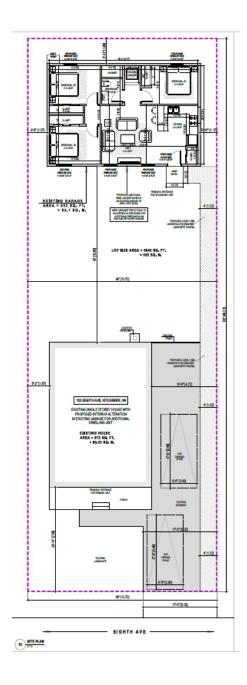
Proposed zoning plan submitted with Zoning Certificate and this application.
